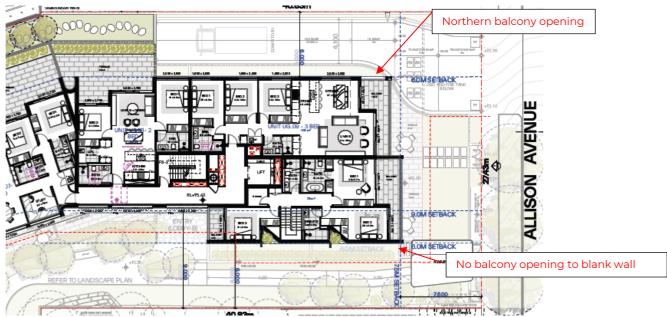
Extracts of Upper Ground Floor Plan showing wall openings to eastern apartments and blank wall to south
